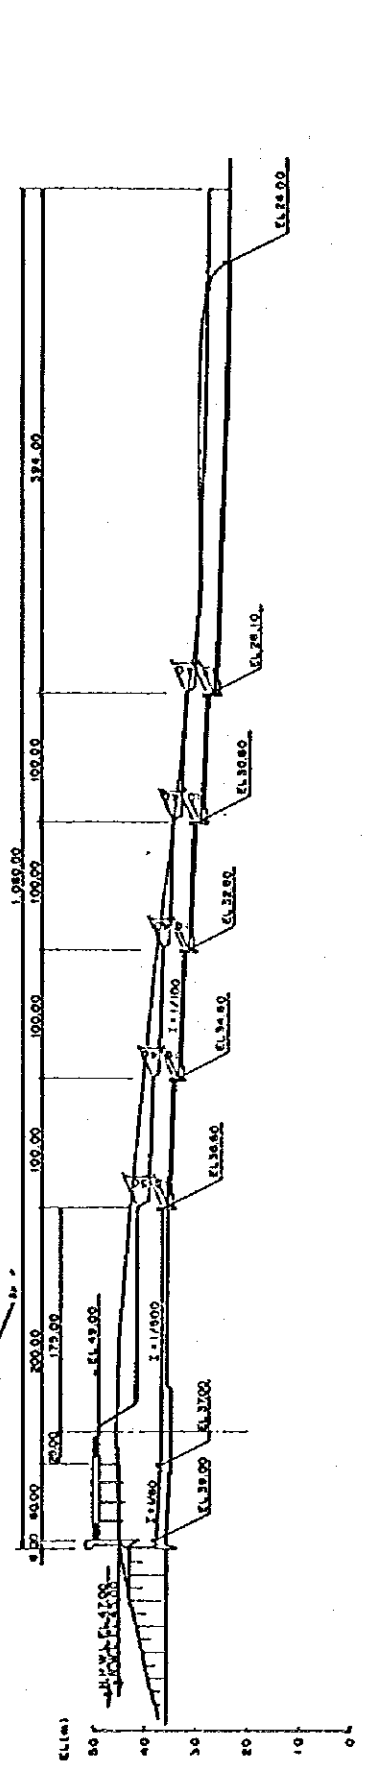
Details of Spillway of Nong Pla Lai Dam
